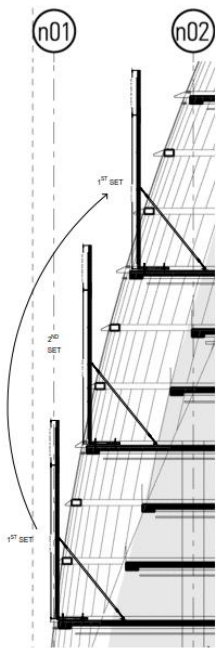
Perimeter Screens to High Rise Raking Southern Elevation
